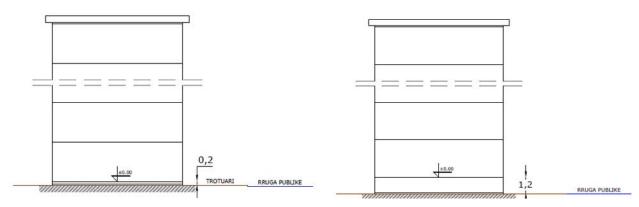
Ground floor of the building in relation to street level (source Urban Regulatory Plan Lakrishte-2007, pg.15).
